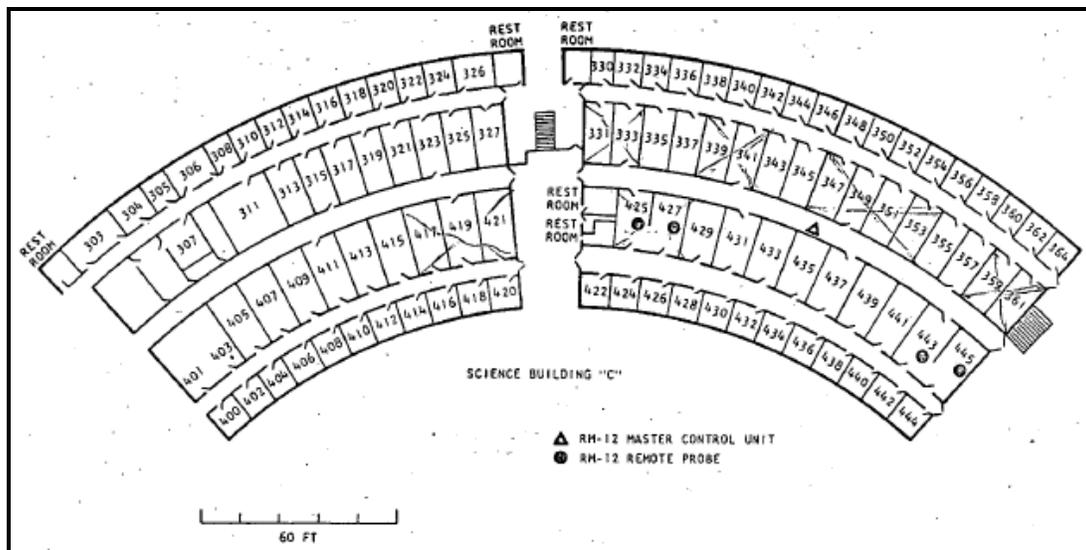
Floor plan of Science Building C (SNM 1963).
